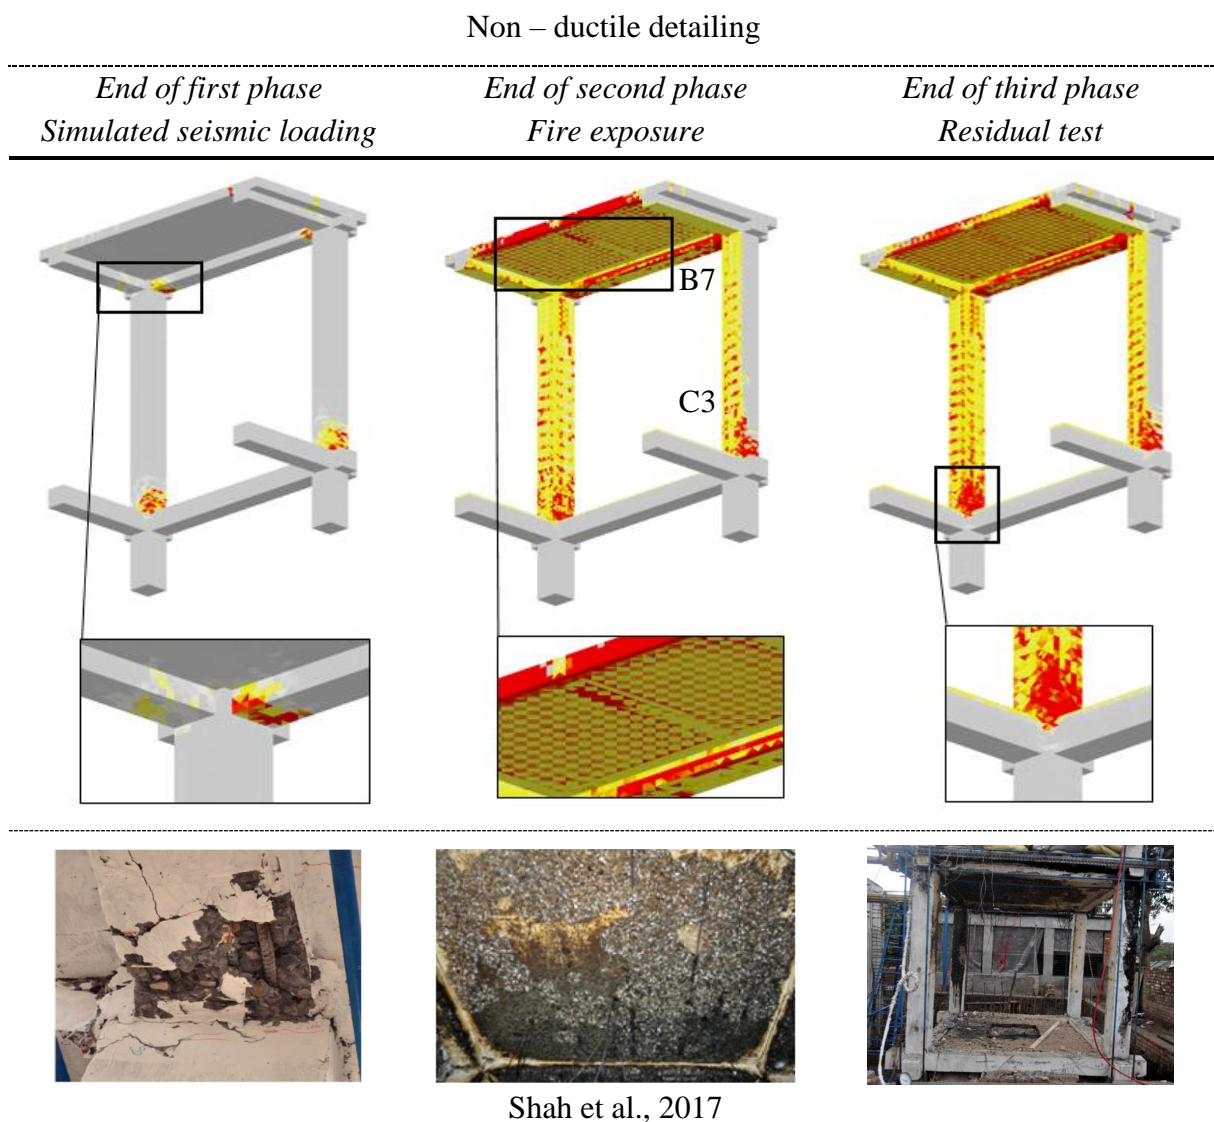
Crack patterns and failure modes from the numerical analysis of RC frame with non-ductile detailing.
